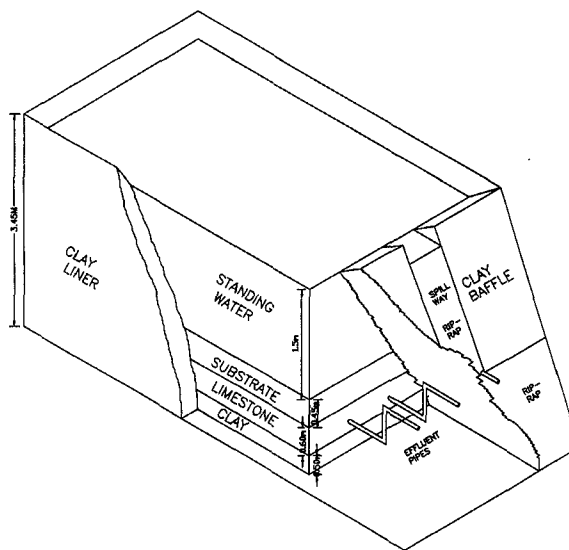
Schematic cross-section illustrating SAPS configuration proposed for full-scale wetland
